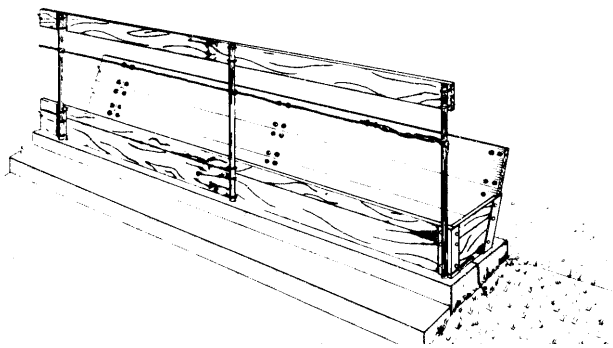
Feed bunks should be built on a concrete base to discourage rodents
